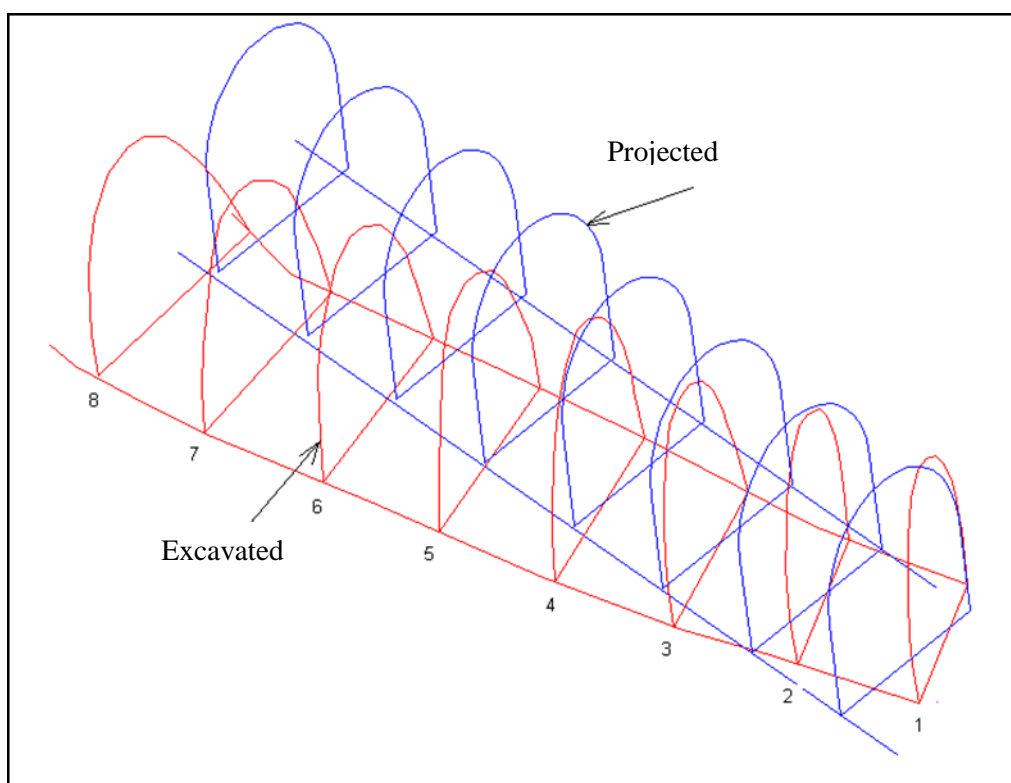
Location of planned and excavated facilities profile in rock type – skarn (every 2.5 m) with innovative technology
